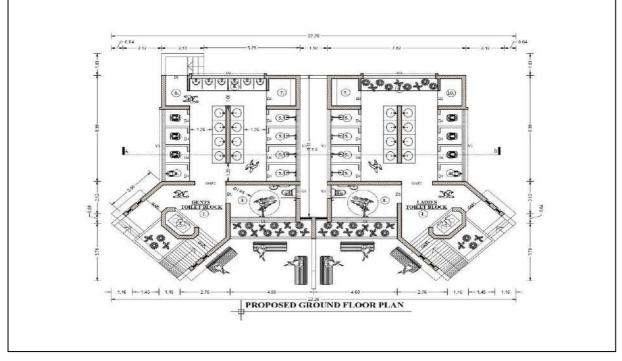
Ground Floor Plan of Publlic Toilets & Baths
